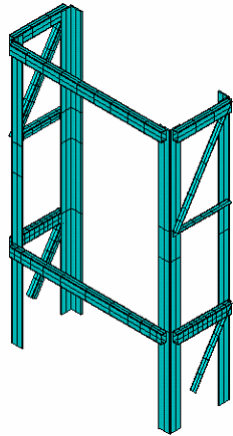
Structure made of angle section profile beams and rectangular cross-section beams
